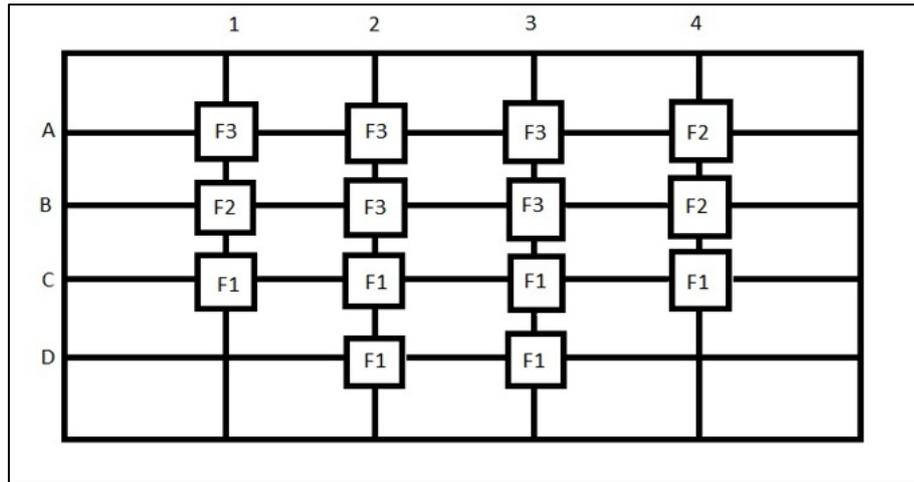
/Rajah 1 : Piling Layout Plan/Pelan Susunatur Cerucuk
